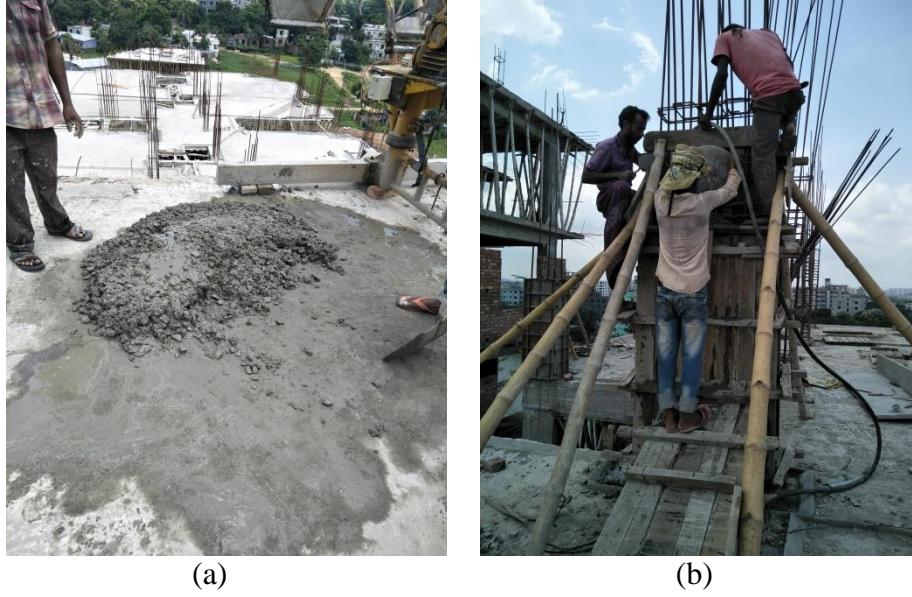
(a) Concrete mixing (b) Column Casting and Using Vibrator Machine
